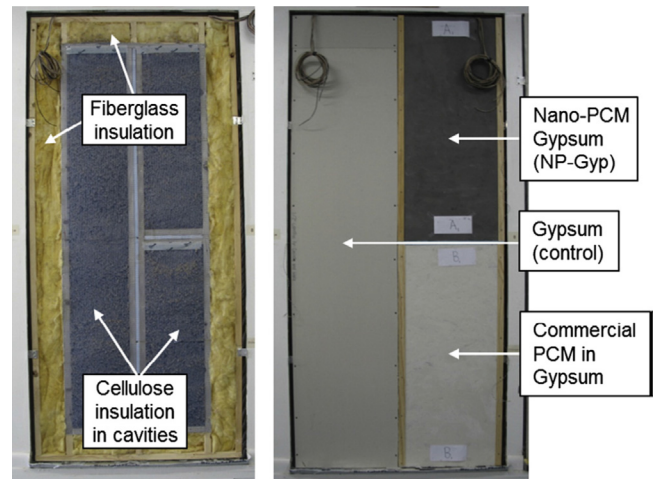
Test wall with PCM-enhanced wallboards [35].
